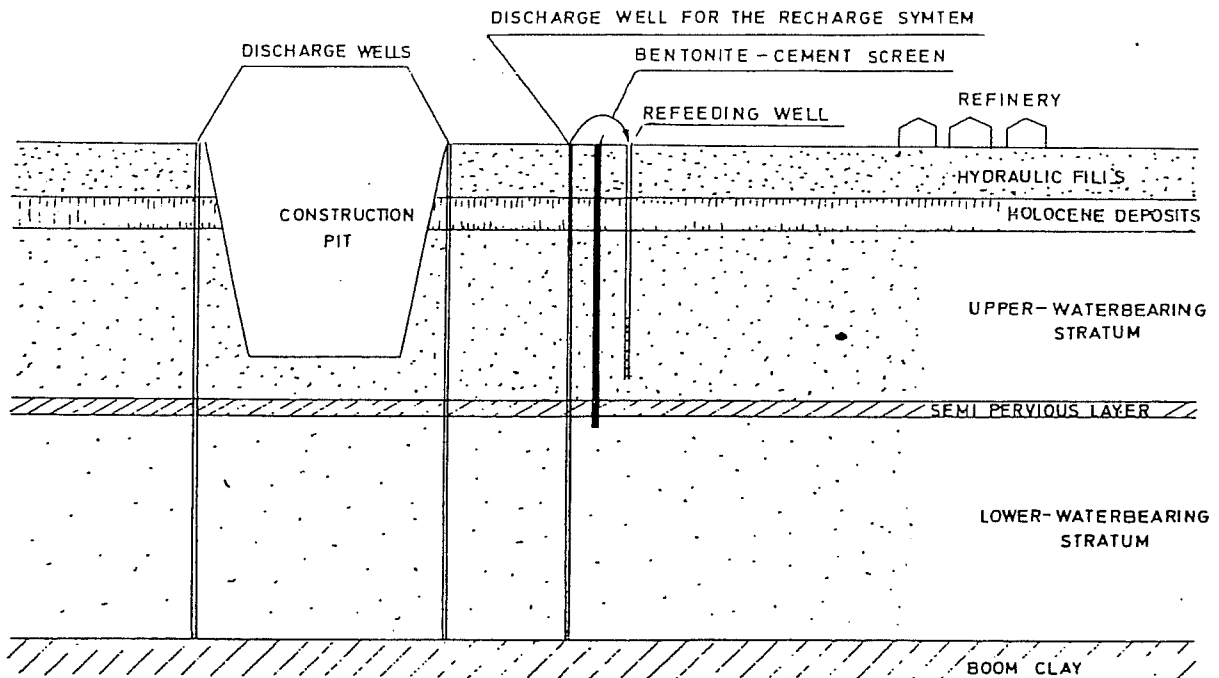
Berendrecht: schematic cross-section of the groundwater refeeding system and of the groundwater lowering system for the construction of the new sea-lock.
